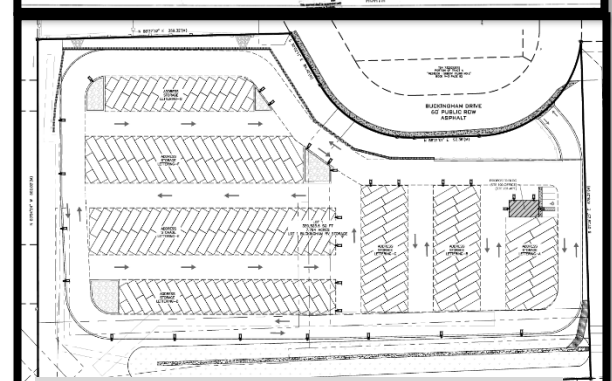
Recreation Vehicle Storage Site Plan - 2021
